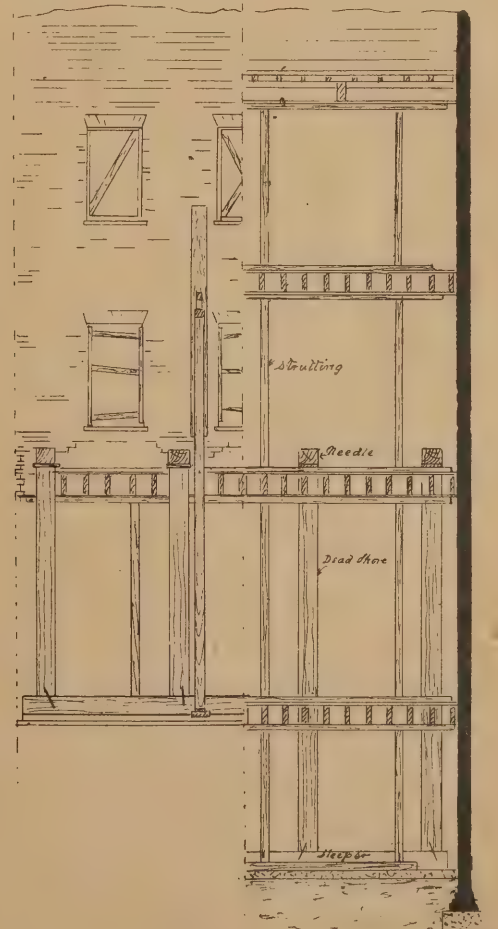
HALF ELEVATION. HALF LONGITUDINAL SECTION.
